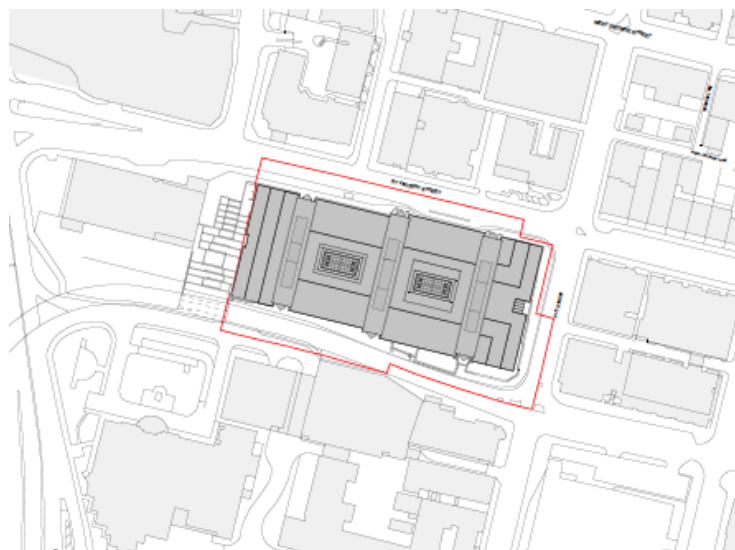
Application Site Boundary from Location Plan prepared by Lom
